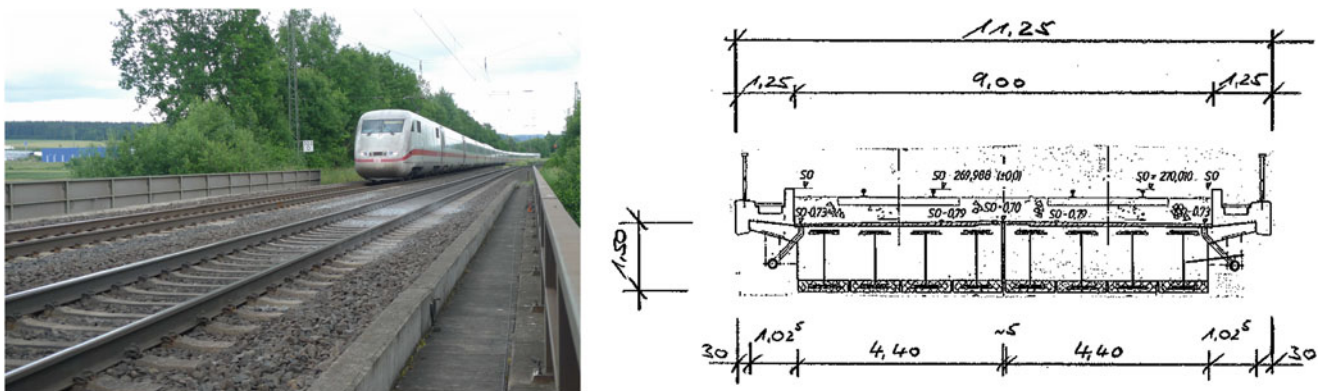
Investigated railway bridge: tracks on ballast (left) and cross-section (right)
